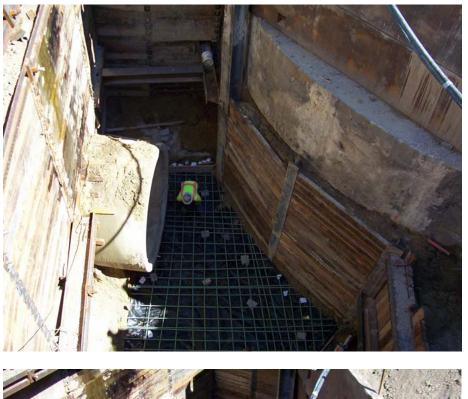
Construction of Campus Drive structure (S-1 in plan set). Contractor shall tap into this structure as detailed in the Special Provisions. The shoring system shown in the photo, or portions of the shoring system were most likely left in place.
